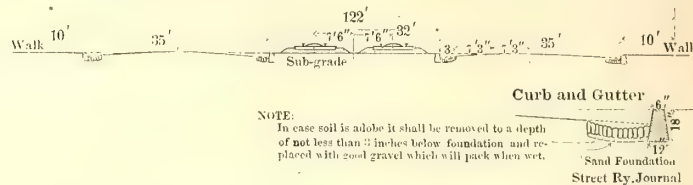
CROSS SECTION OF TRACK ON BOULEVARD, SAN MARENO AND LAMANDA PARK EXTENSIONS
